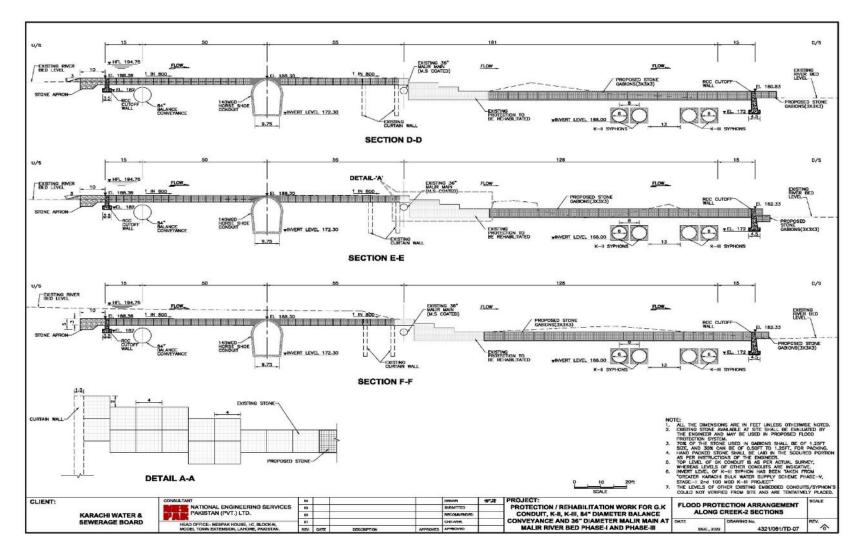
Flood Protection Arrangement along Creek-2 Section & Details
